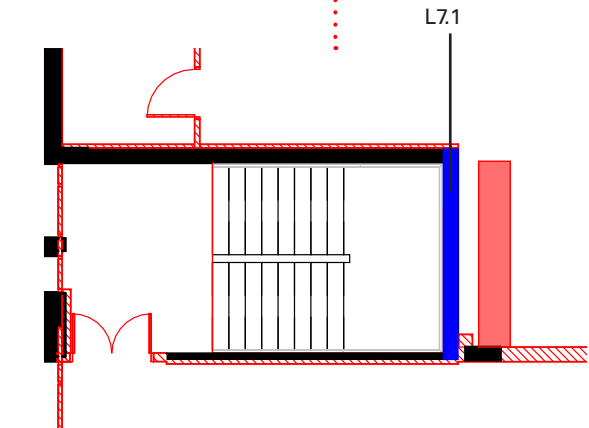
Proposed Level 07 Demolition Plan - Detail View
